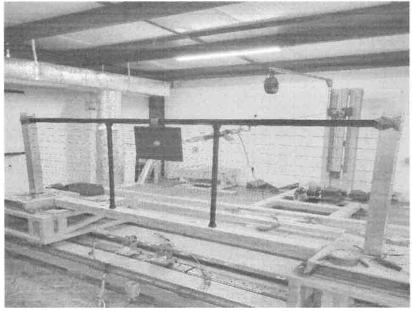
Test No. 1 – Infill Load Test (Top)
